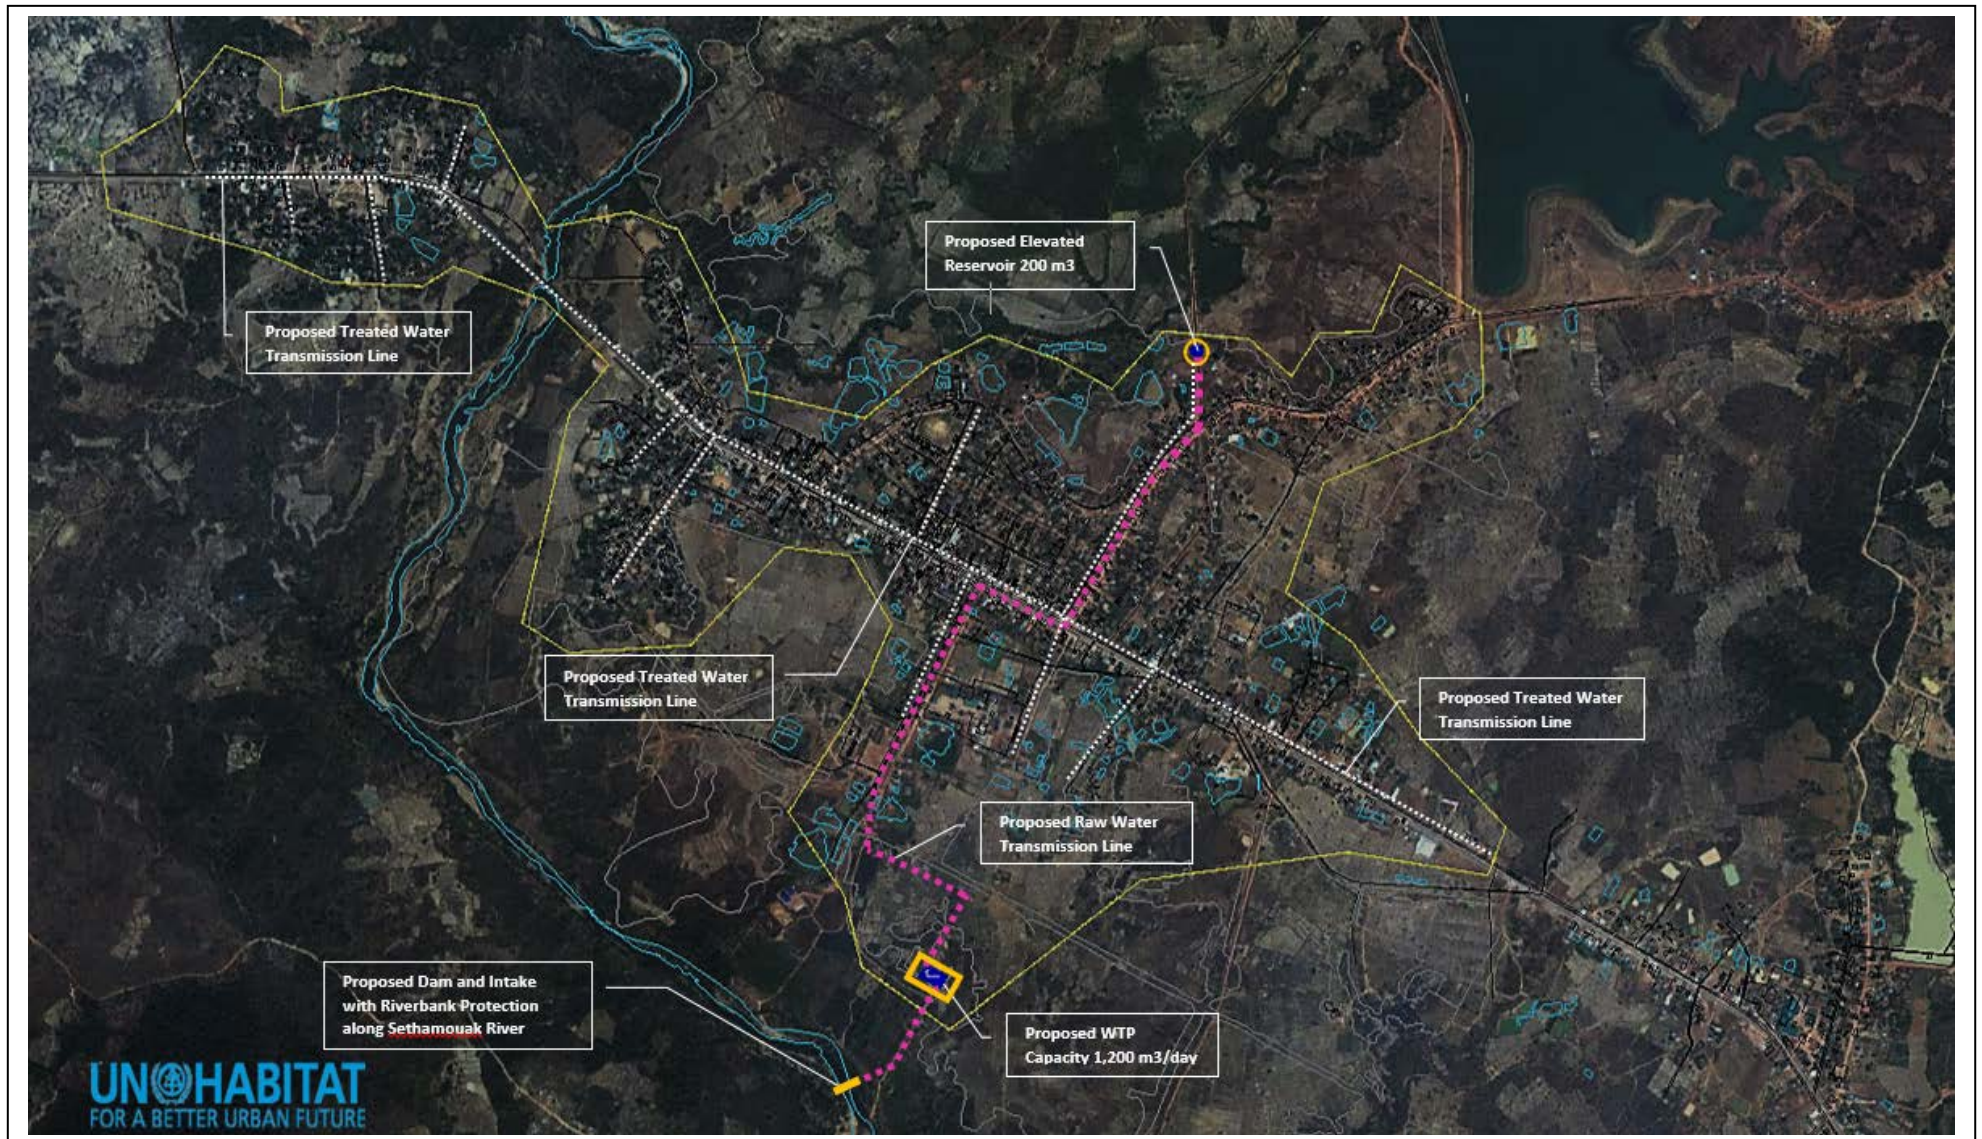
Location Plan of Proposed Sethamouak Water Treatment Plan
